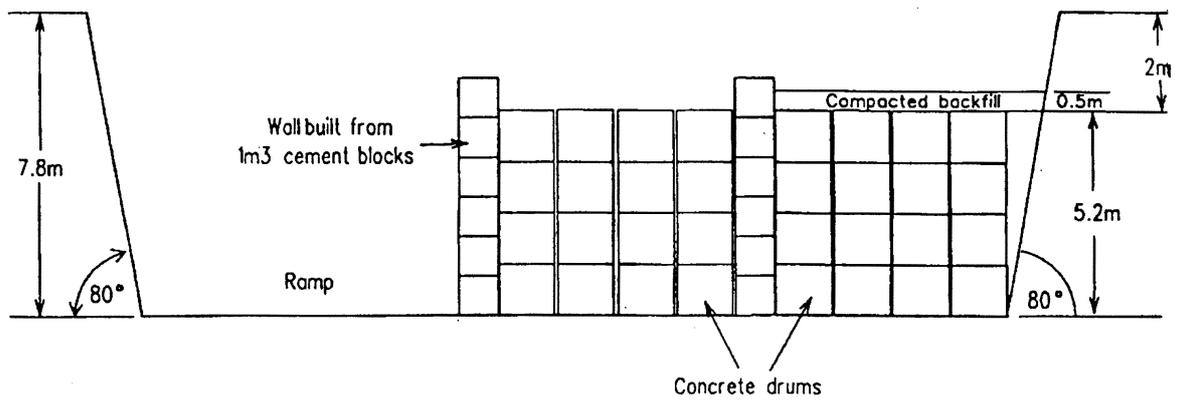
Cross-section through proposed disposal modules (South Africa).
